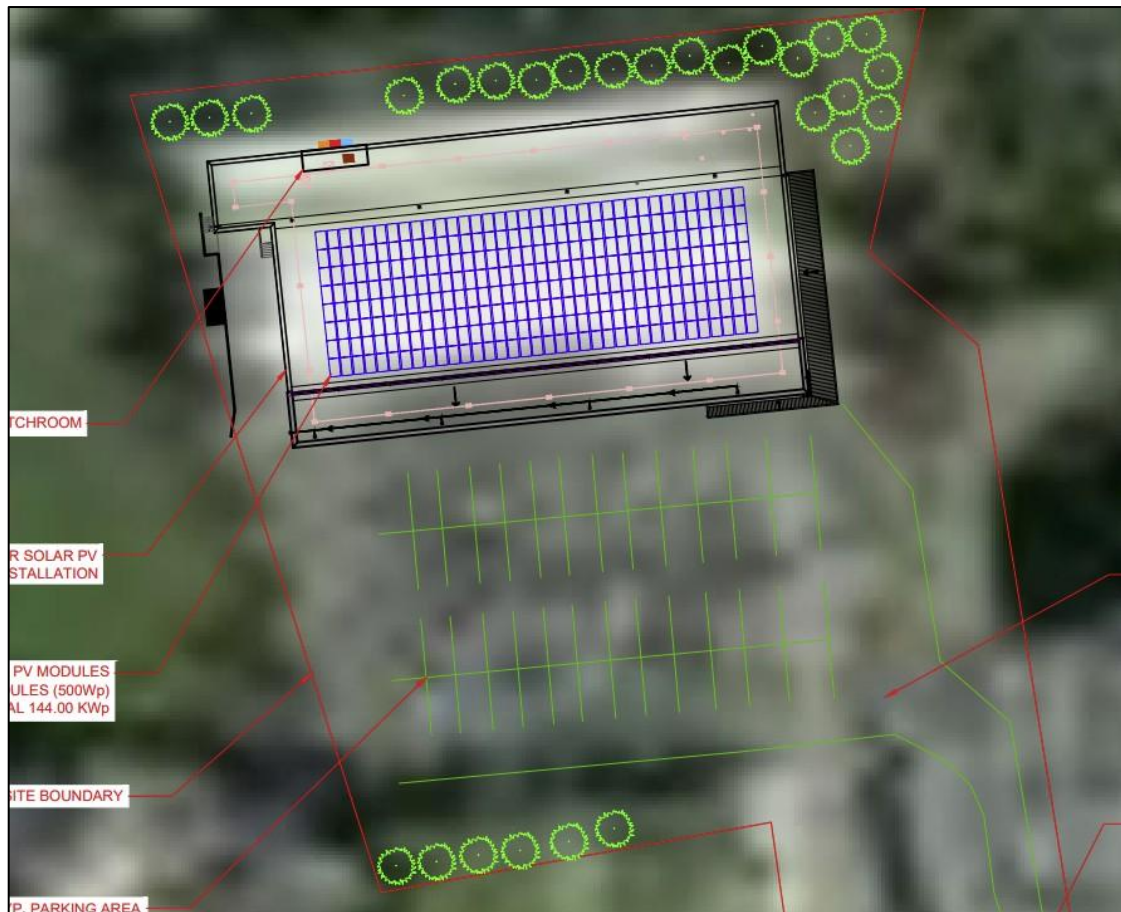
Extract from Overall Site Plan drawing showing the proposed site and panel layout.
